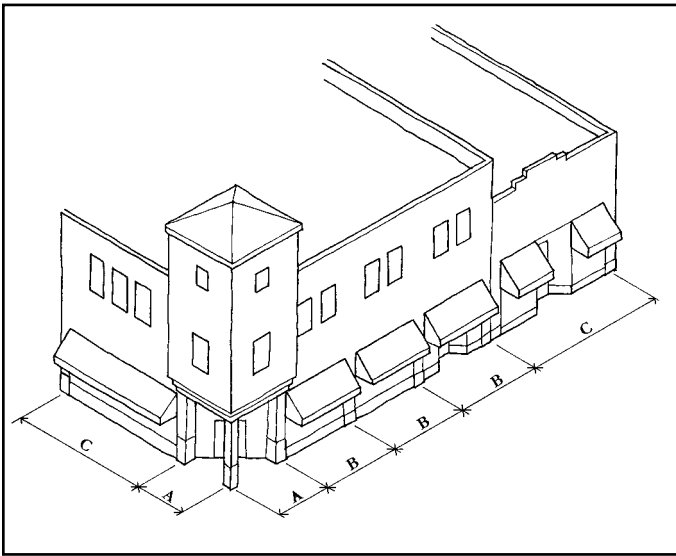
Building facades should be proportioned to reflect the scale, variety, and rhythm of historic commercial buildings in Niles
